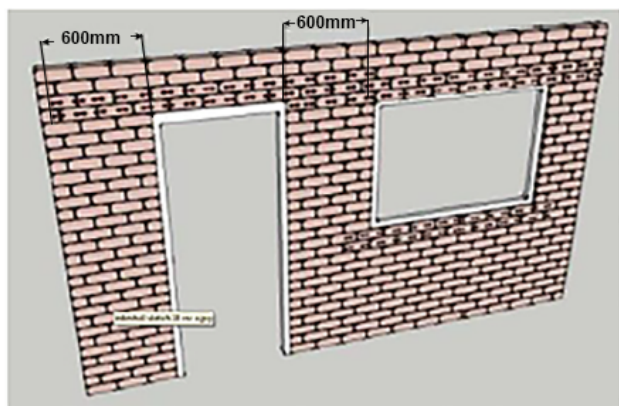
Example of bed joint reinforcement (courtesy of Edenhall)
